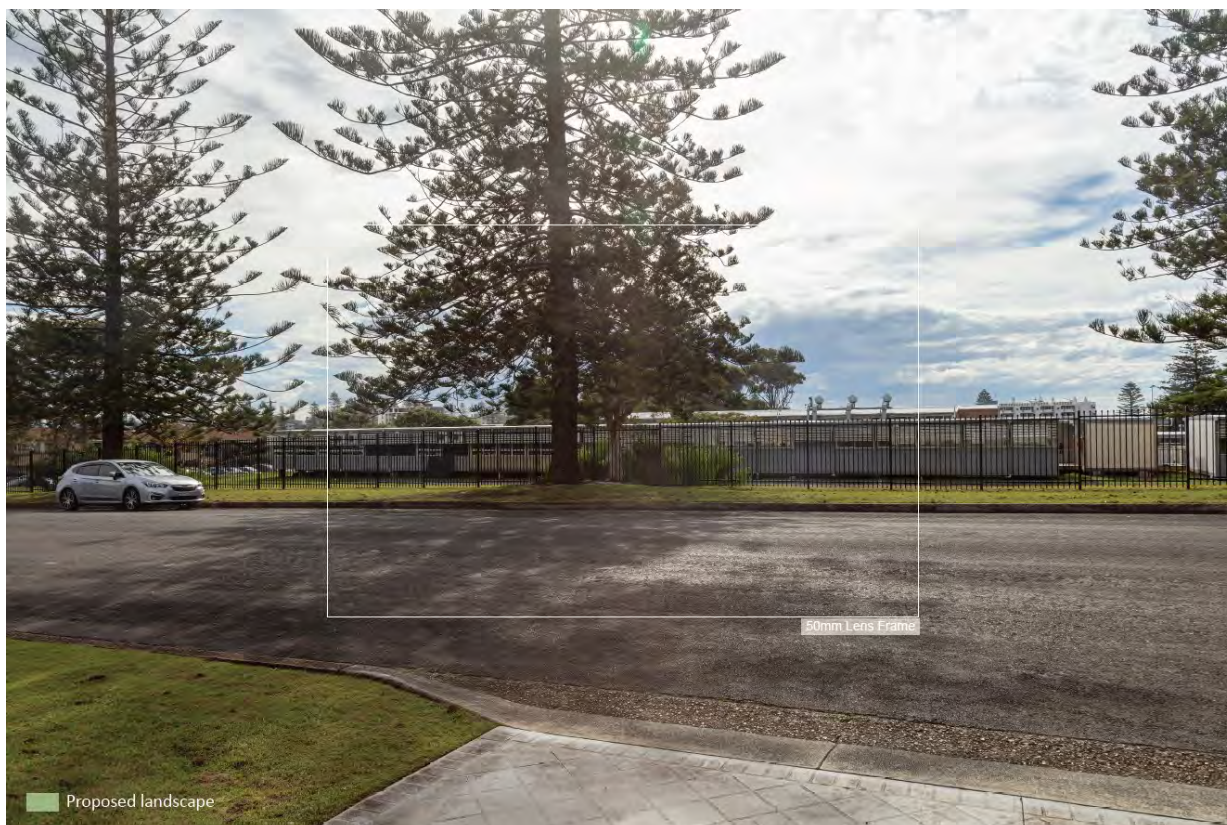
Viewpoint 3 – Burrawan Street: proposed view
